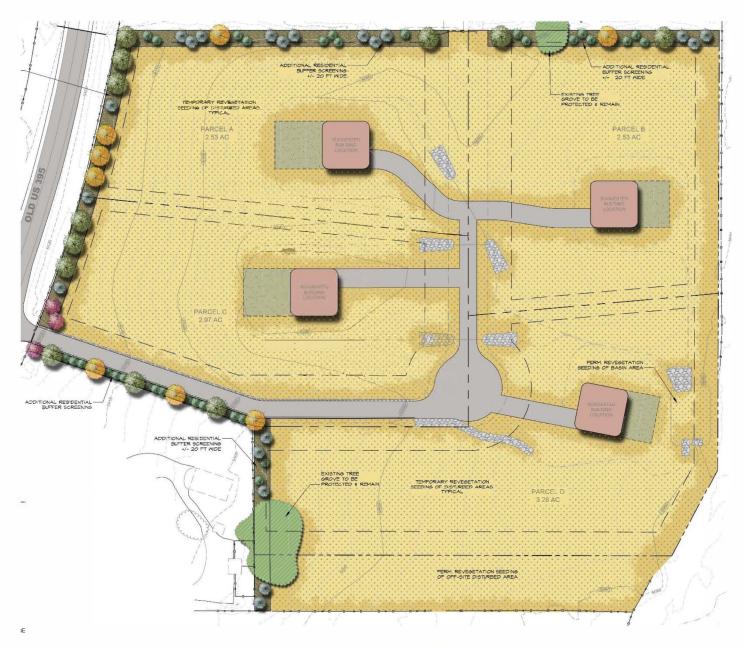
Landscape Plan Submitted 9/8/22 SUP Application (72 trees along north & west p.l.)
